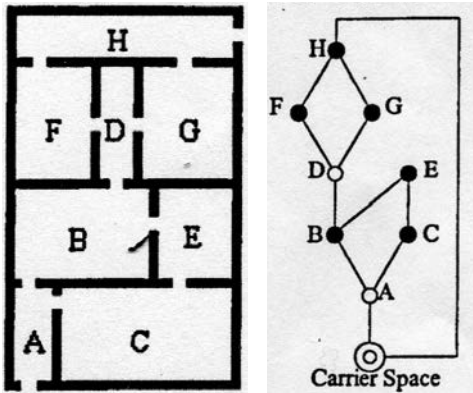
Conjectural plan of a simple building (left), and an access diagram of that building (right).
